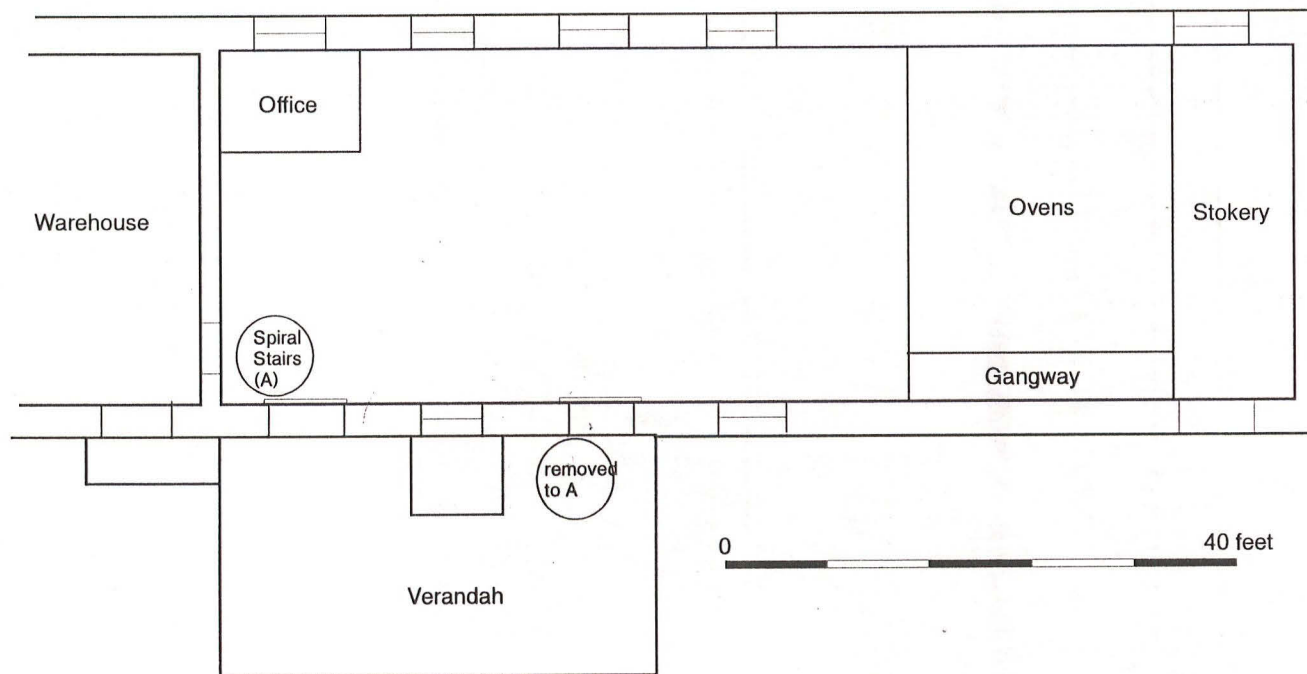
Boston Co-operative Society building, Paddock Grove. Ground floor plan, showing revised bakery layout after rebuild, July 1909 (Lincolnshire Archives Sher Plans B274/1)
